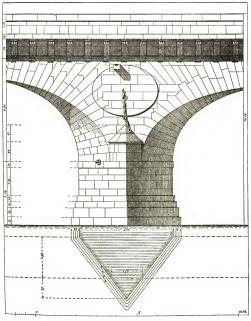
The Pont Henri IV at Châtellerault (1565-1609); downstream face of a pier, showing the splay of the arches.
